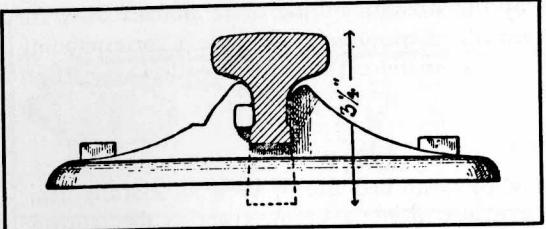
Rolled iron edge rail, made in 15-foot sections and supported at joint by cast iron chairs.
